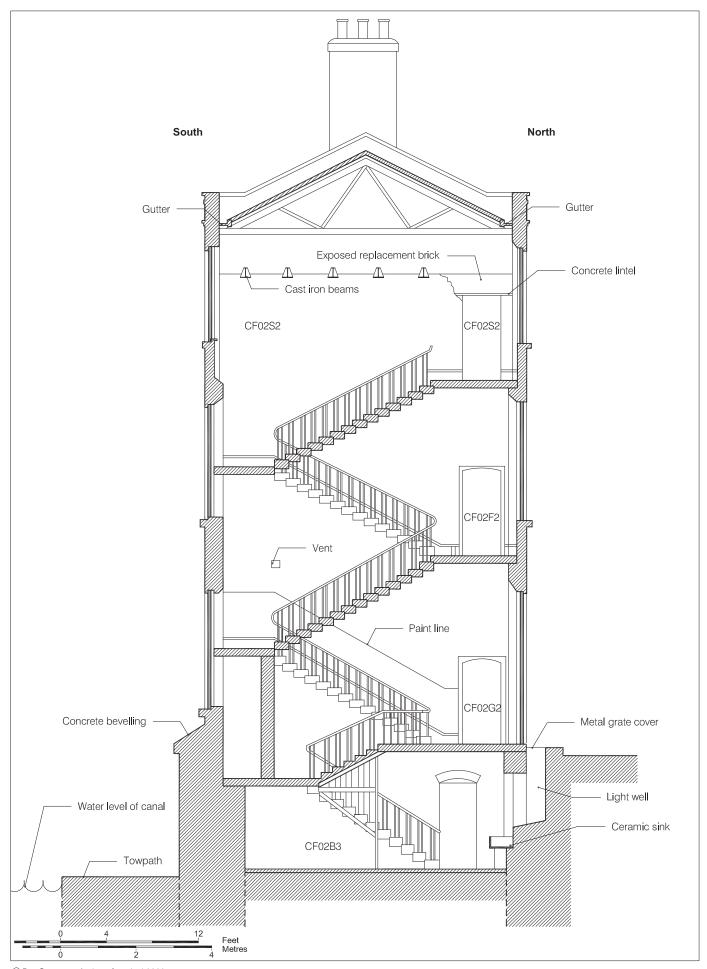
Cross Sectional Elevation through Block 1(Looking East) Coal and Fish Offices 1:100 at A4
